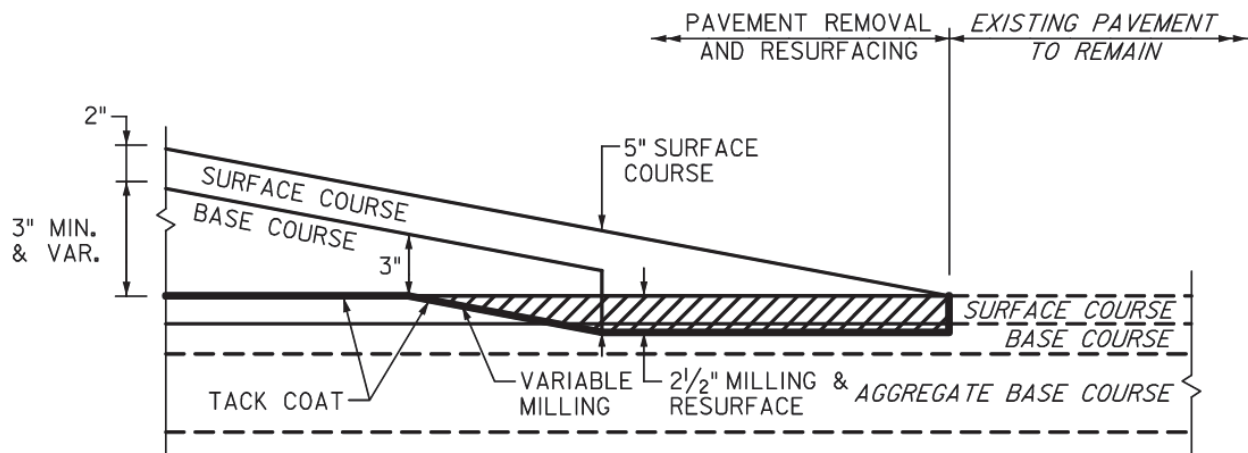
Parkway Pavement Removal & Reconstruction Detail
